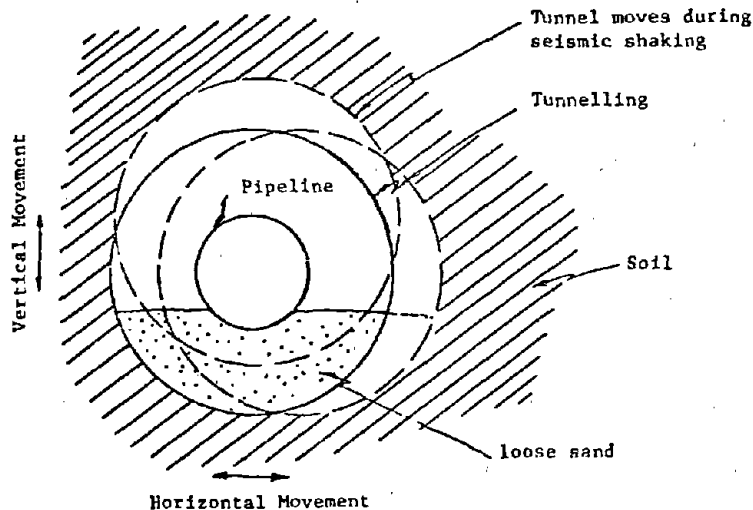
Encasement of a pipeline in a tunnel to protect against damage caused by fault movement (155, 044).
